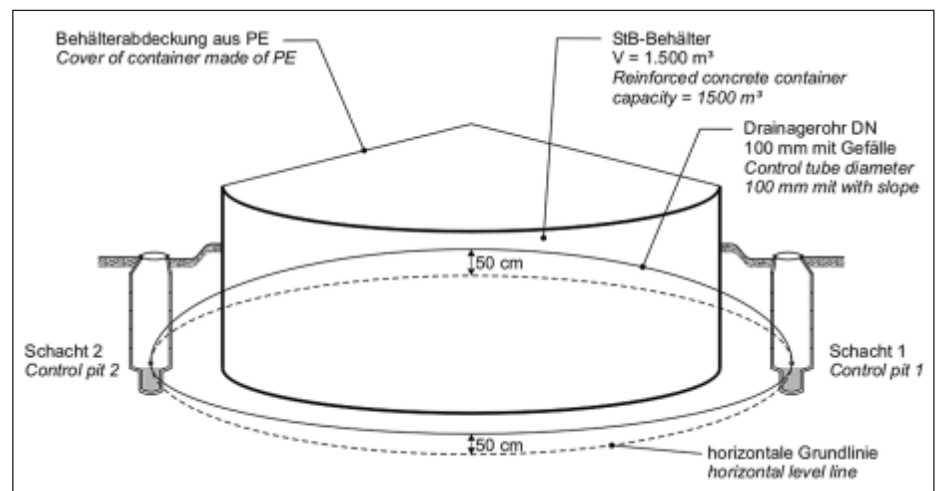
Slurry container made of reinforced concrete with leakage control (sketch)
